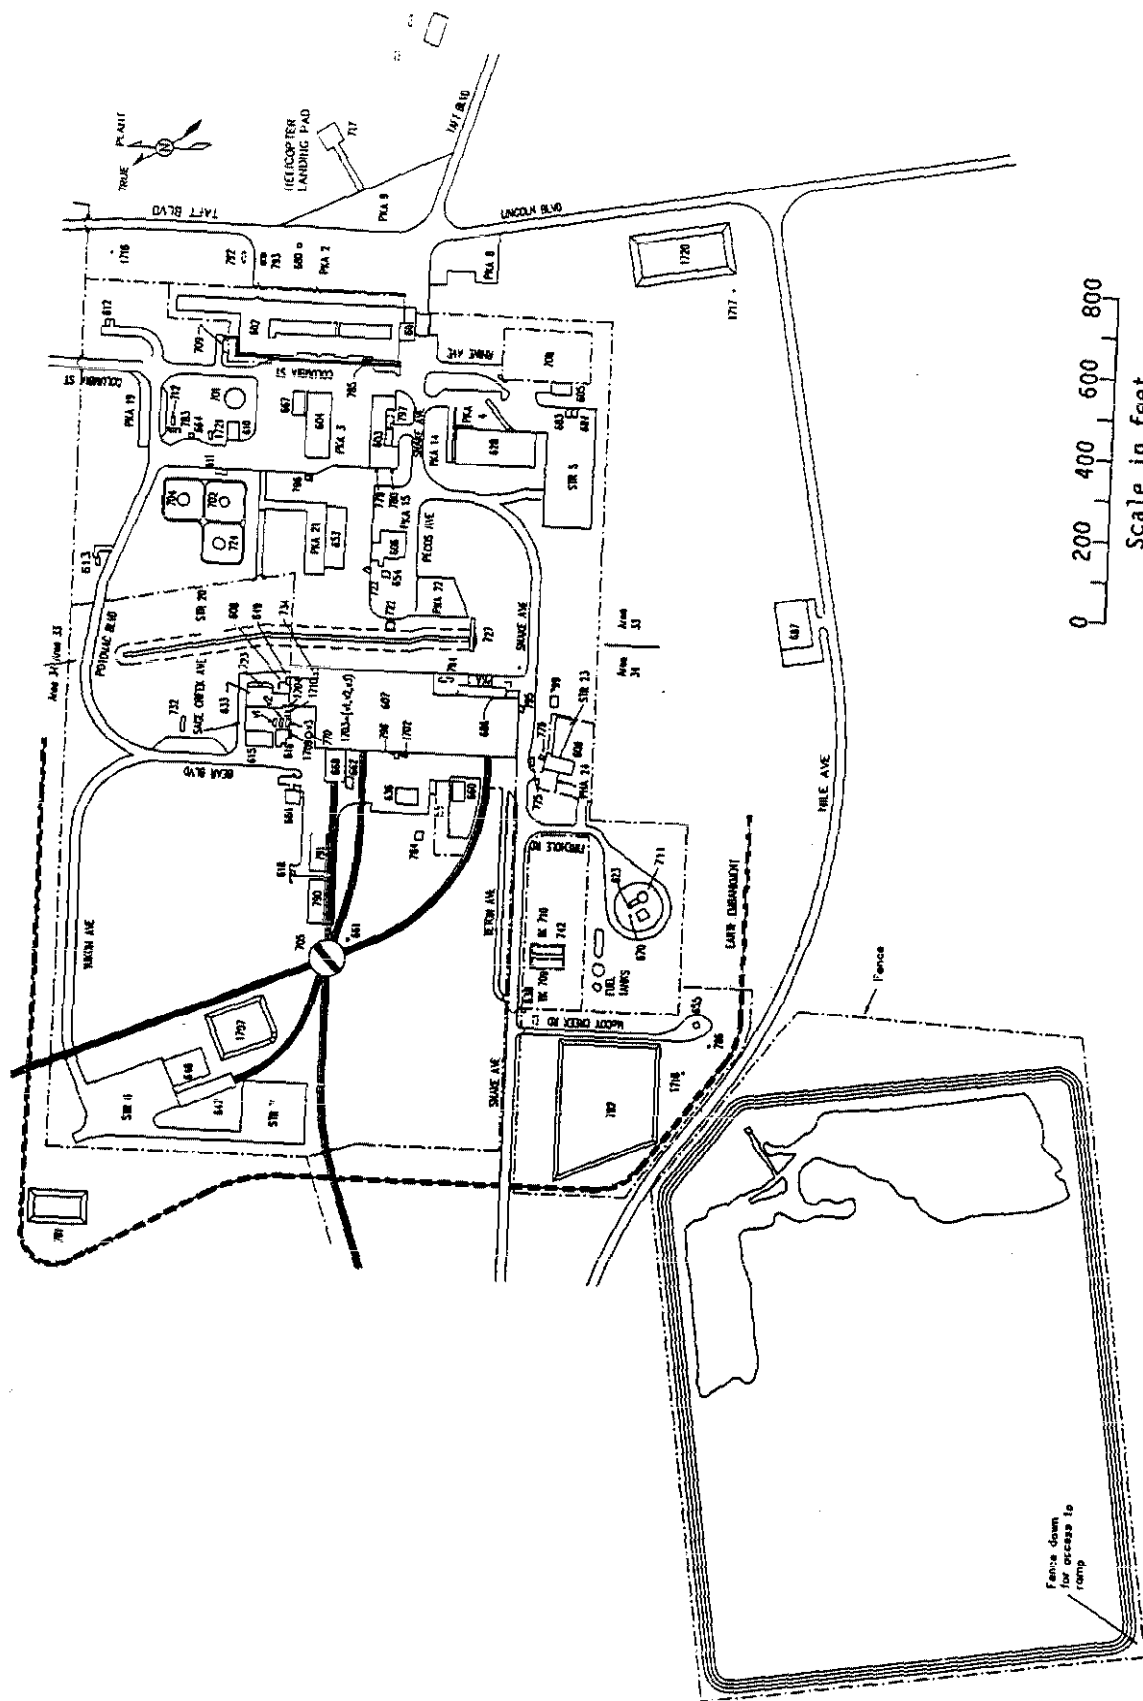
The Test Area North/Technical Support Facility plot plan.
